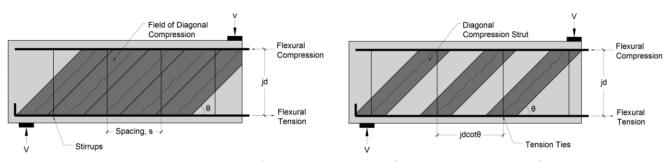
Diagonal stress fields in a cracked reinforced concrete beam (left) and Simplified truss model for concrete members subjected to shear (right)
